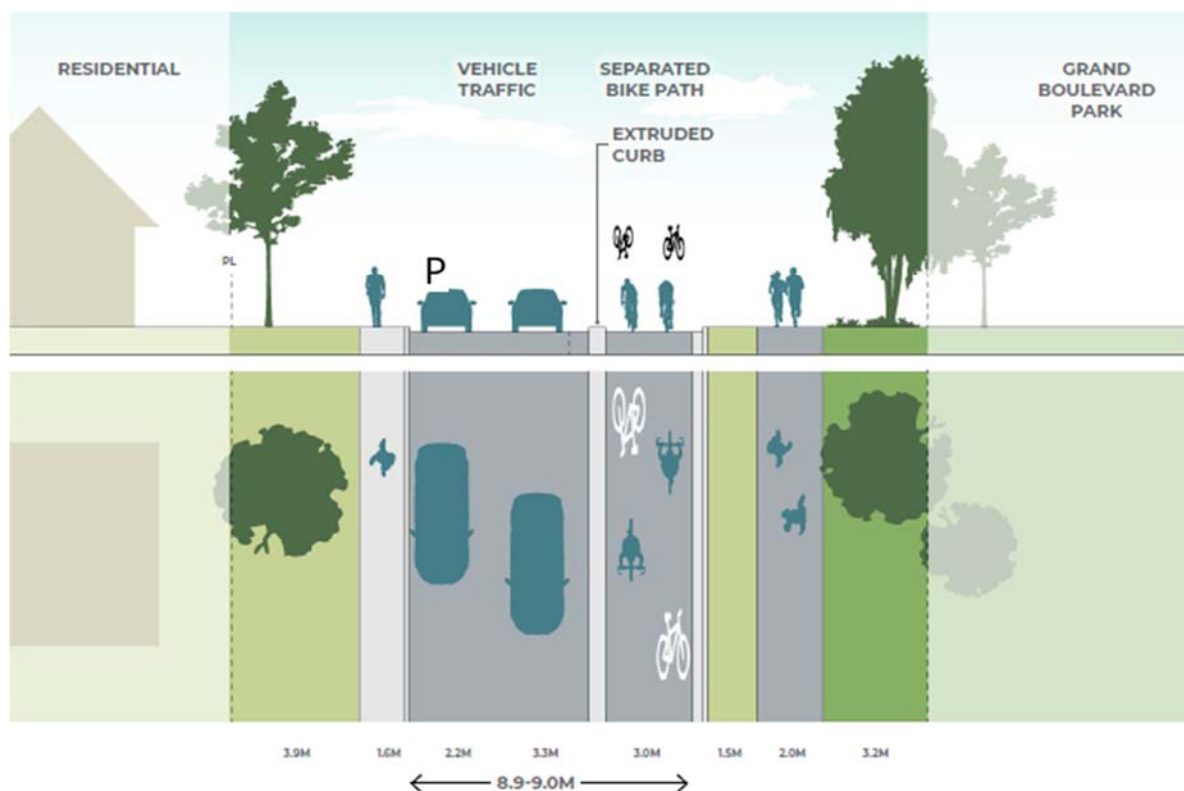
Typical West Grand Boulevard plan and section view with a bi-directional mobility lane separated from southbound vehicle traffic by a concrete curb.
